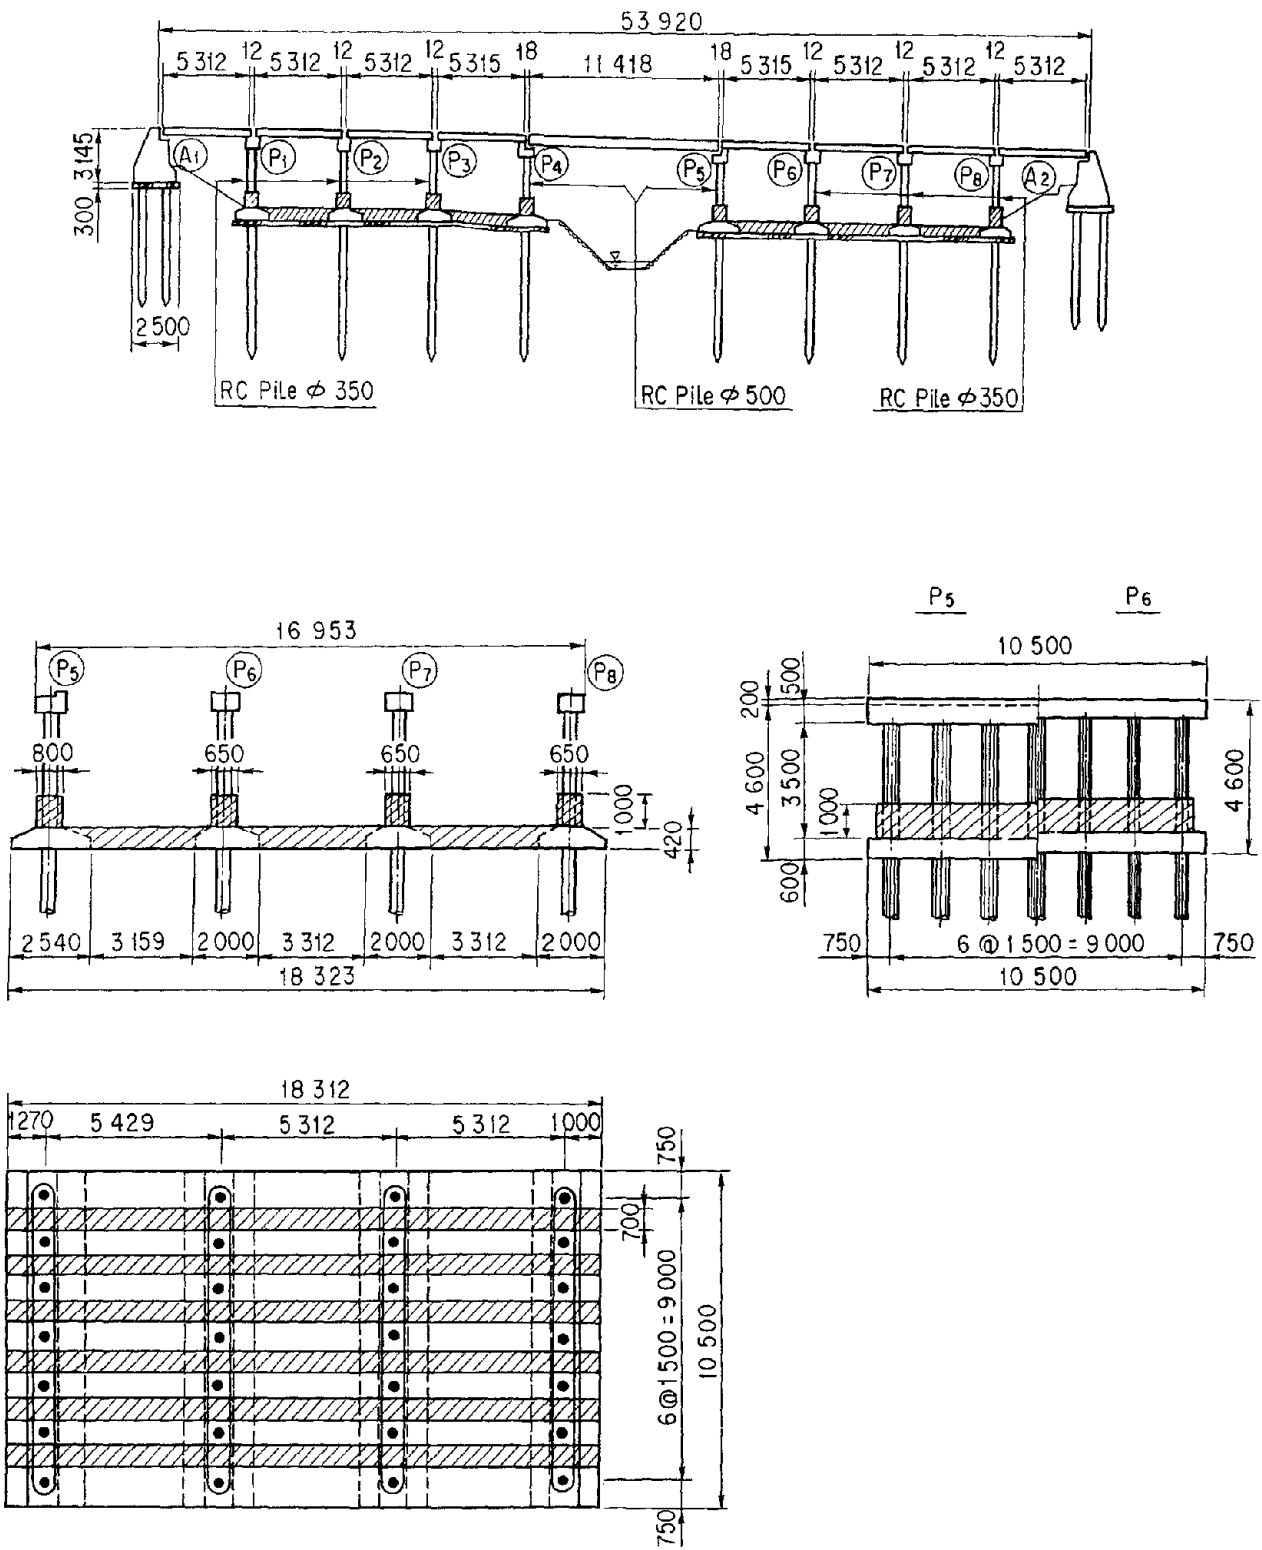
Seismic Strengthening of Bent Piles by New Concrete Walls and New Connection Slabs
